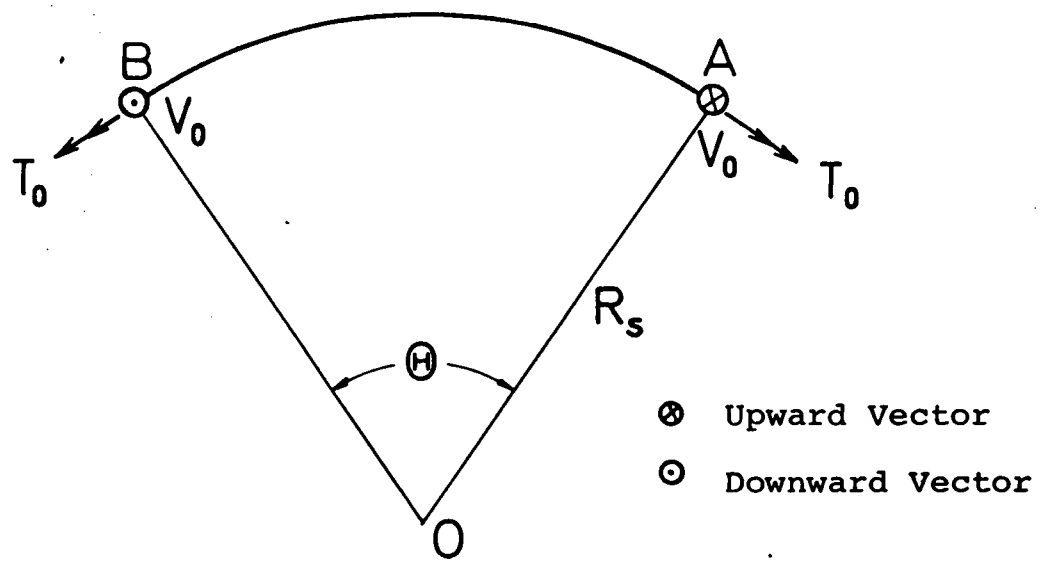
Curved Girder Bridge in Pure Torsion
